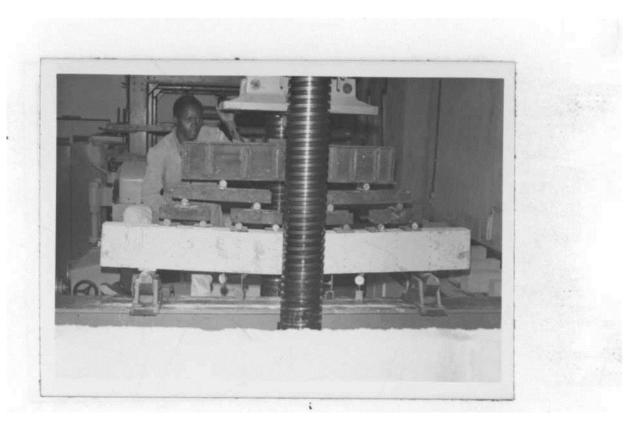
Diagonal cracking of beam G2/L during loading.
